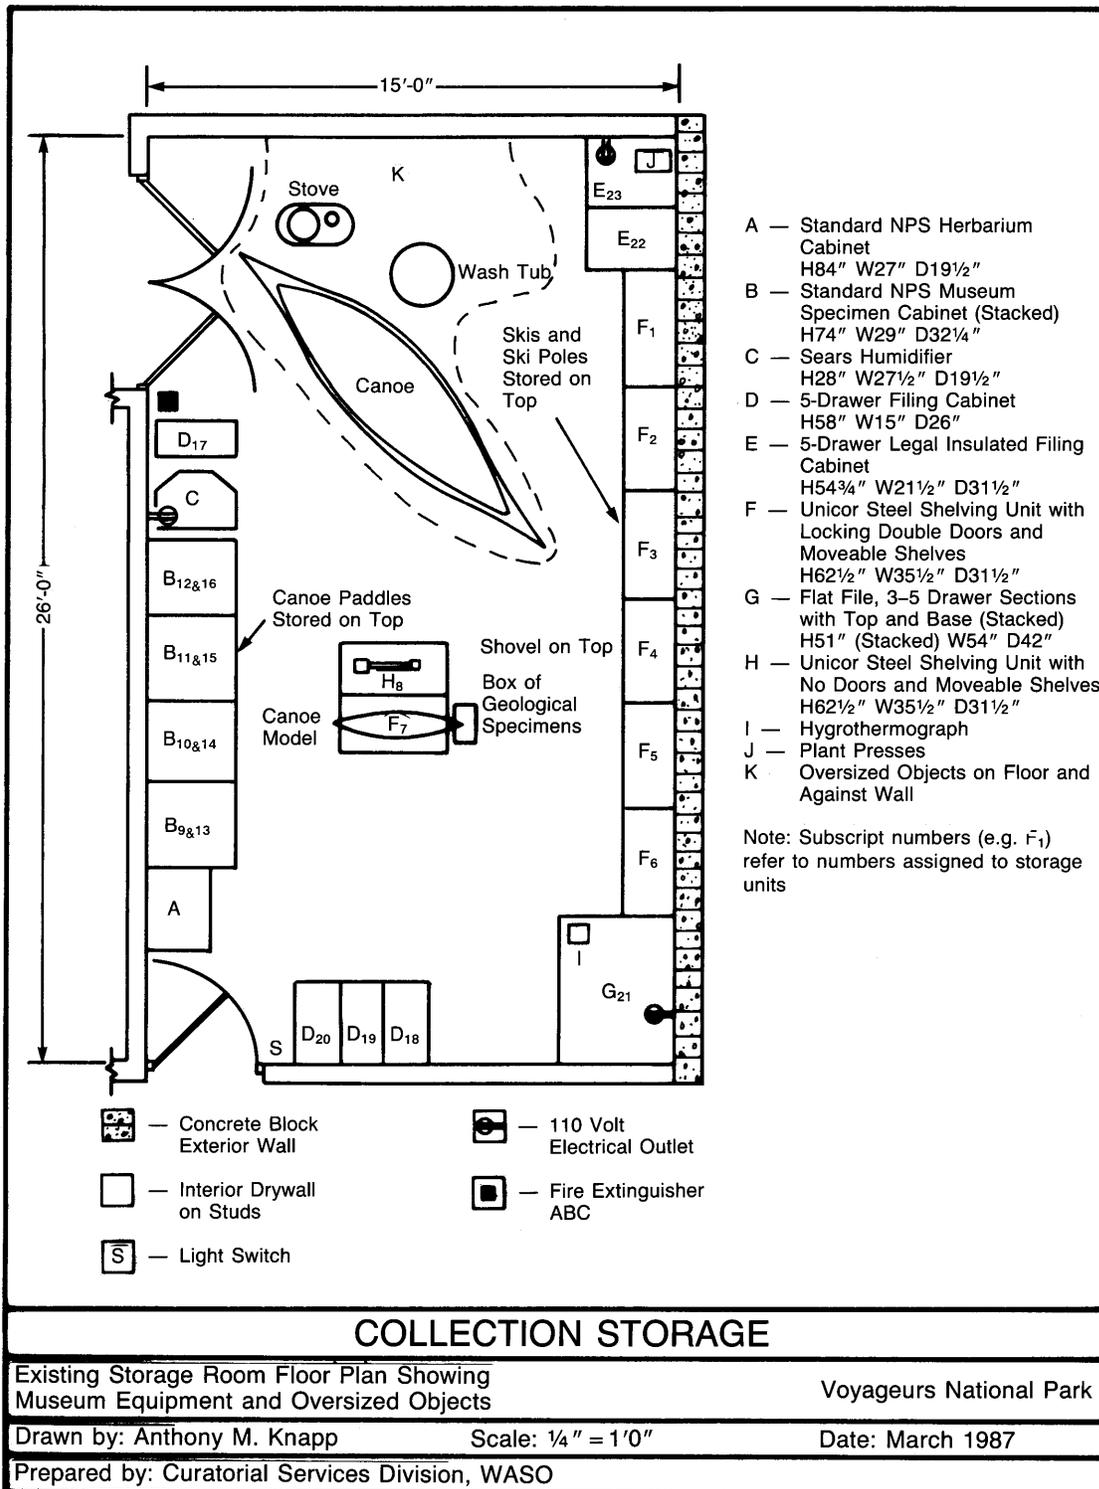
Floor Plan of Museum Collection Storage Room at Voyageurs National Park (Scale: 1/4"=1'0"). Floor plan shows existing museum equipment and oversized objects.
